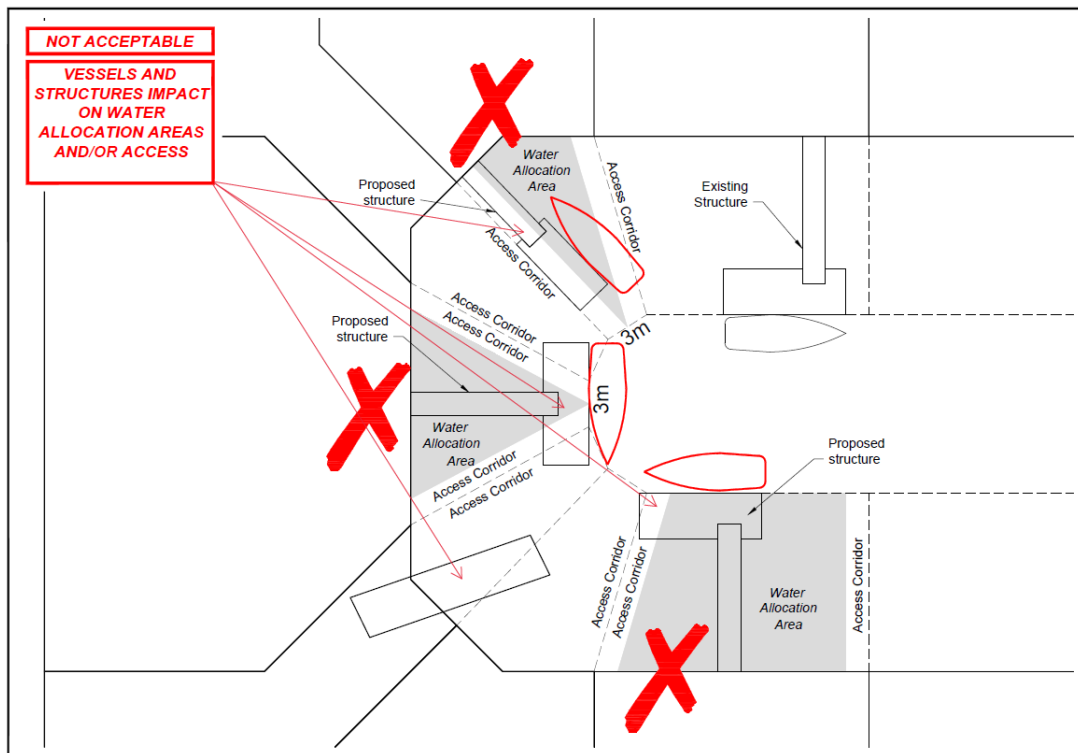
Example of unacceptable site and layout plan and water allocation area plan
